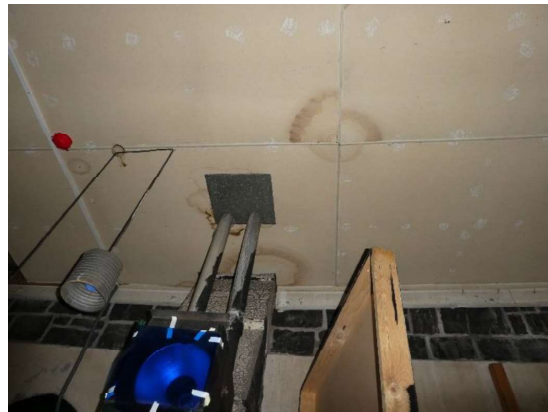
Showing typical moisture damage and decay to the rafters built into the solid external walls to the southern wall of the main theatre.
